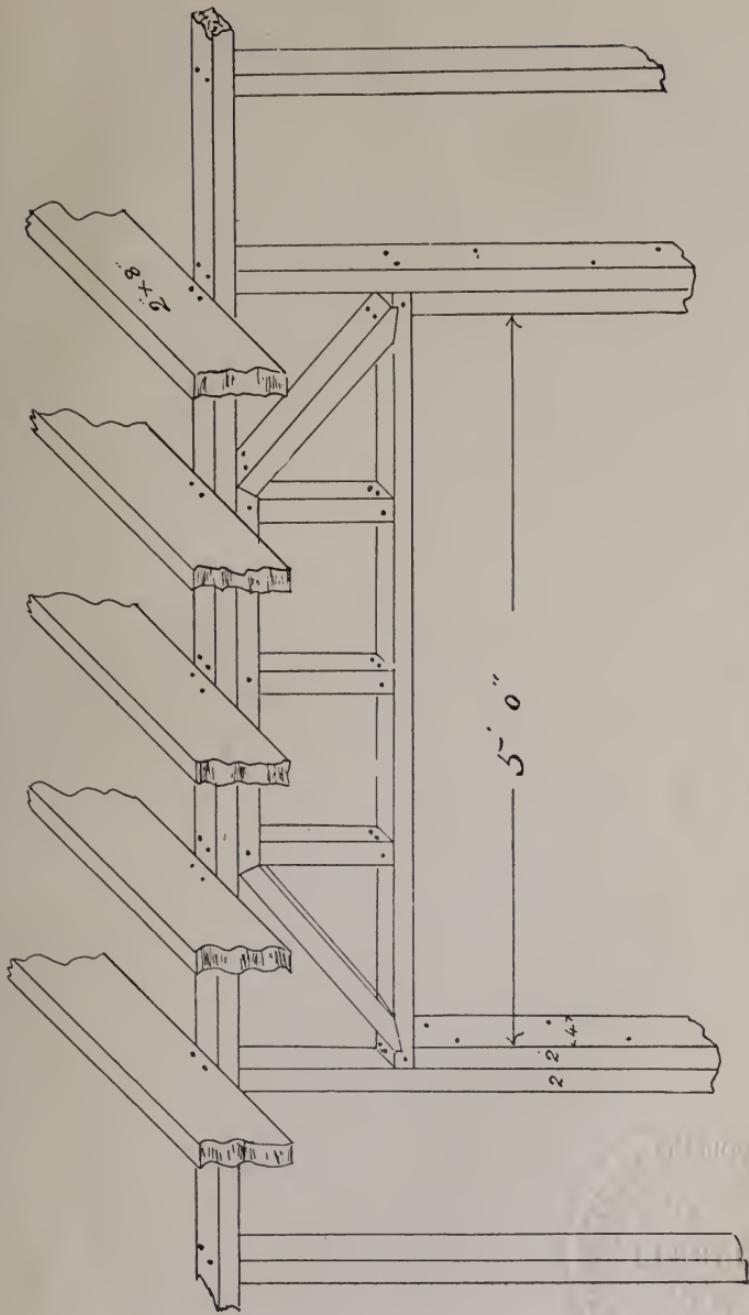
SHOWING TRUSSING OVER WIDE DOOR OPENING.
